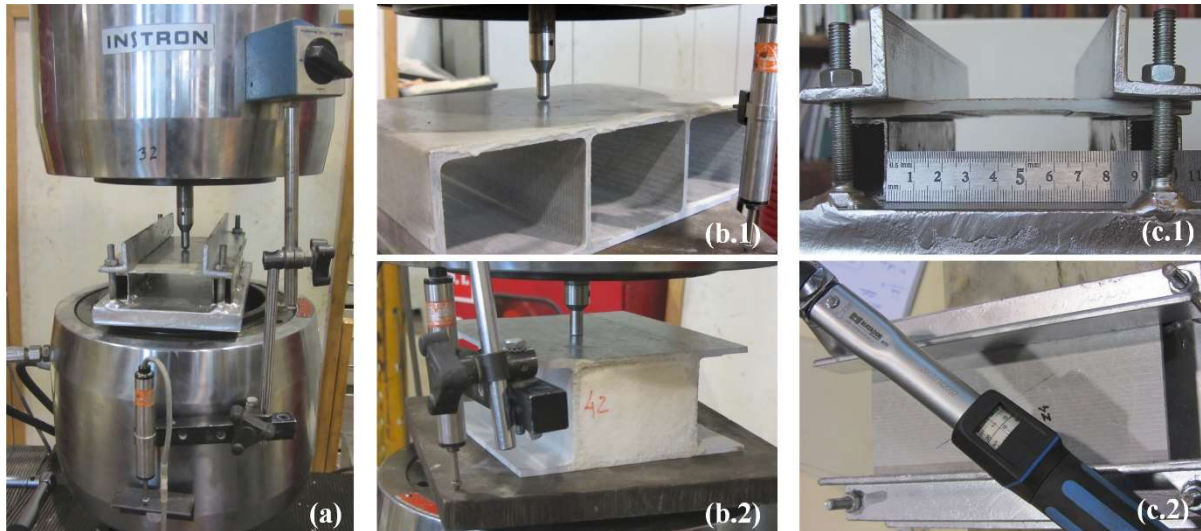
Test setups: (a) *Instron* universal test machine, (b.1-2) load application on cellular specimens and (c.1-2) supporting and clamping system for the laminated plate specimens.
